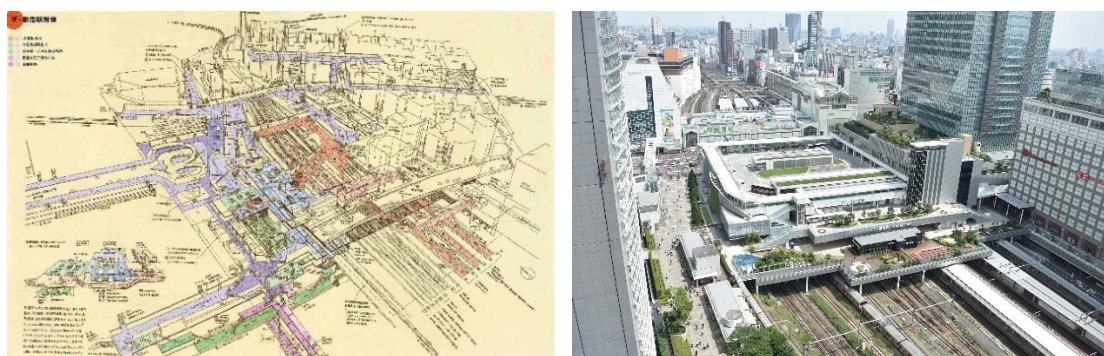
Underground System around Shinjuku Station in Tokyo
